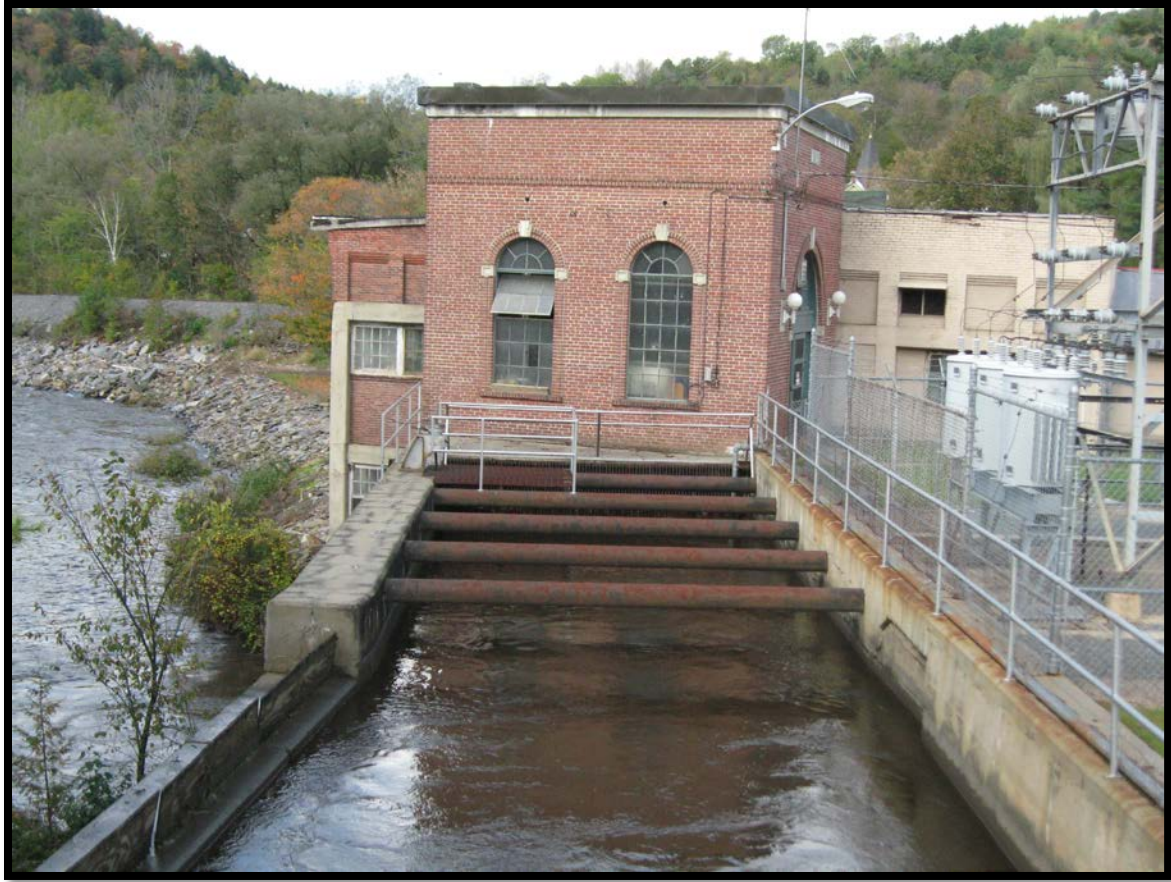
POWER CANAL, POWERHOUSE, AND TAILRACE
